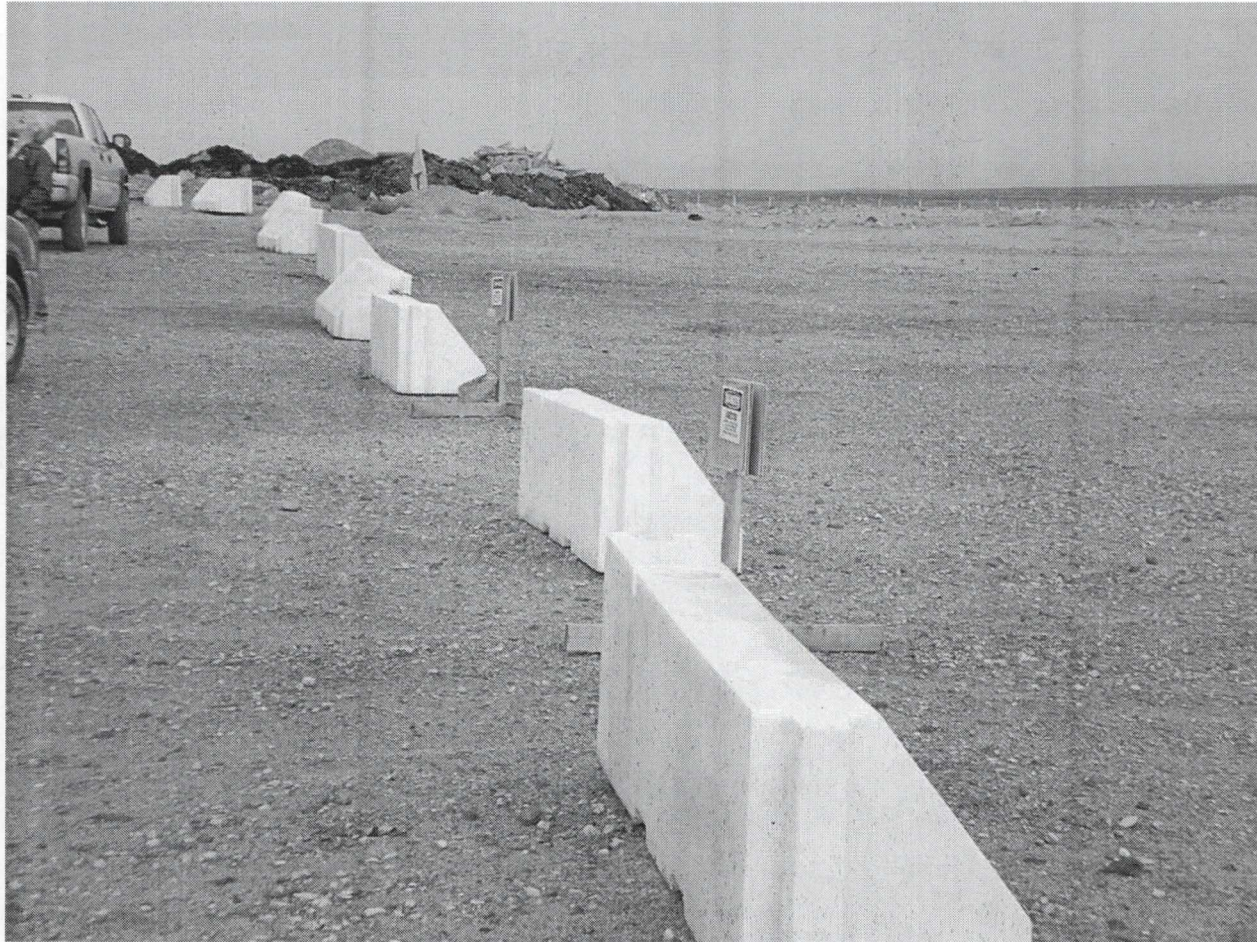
Barriers preventing entry to portion of Verlinde Hills rubble pile – rubble containing probable transite pipe from Phase 6 & 7 disposed in this area
